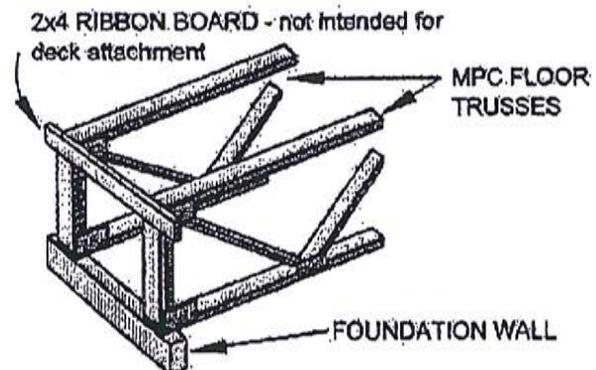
B: Metal Plate Connected (MPC) Wood Floor Trusses with a 2x4 Lumber "Ribbon" at the Ends of the Trusses
